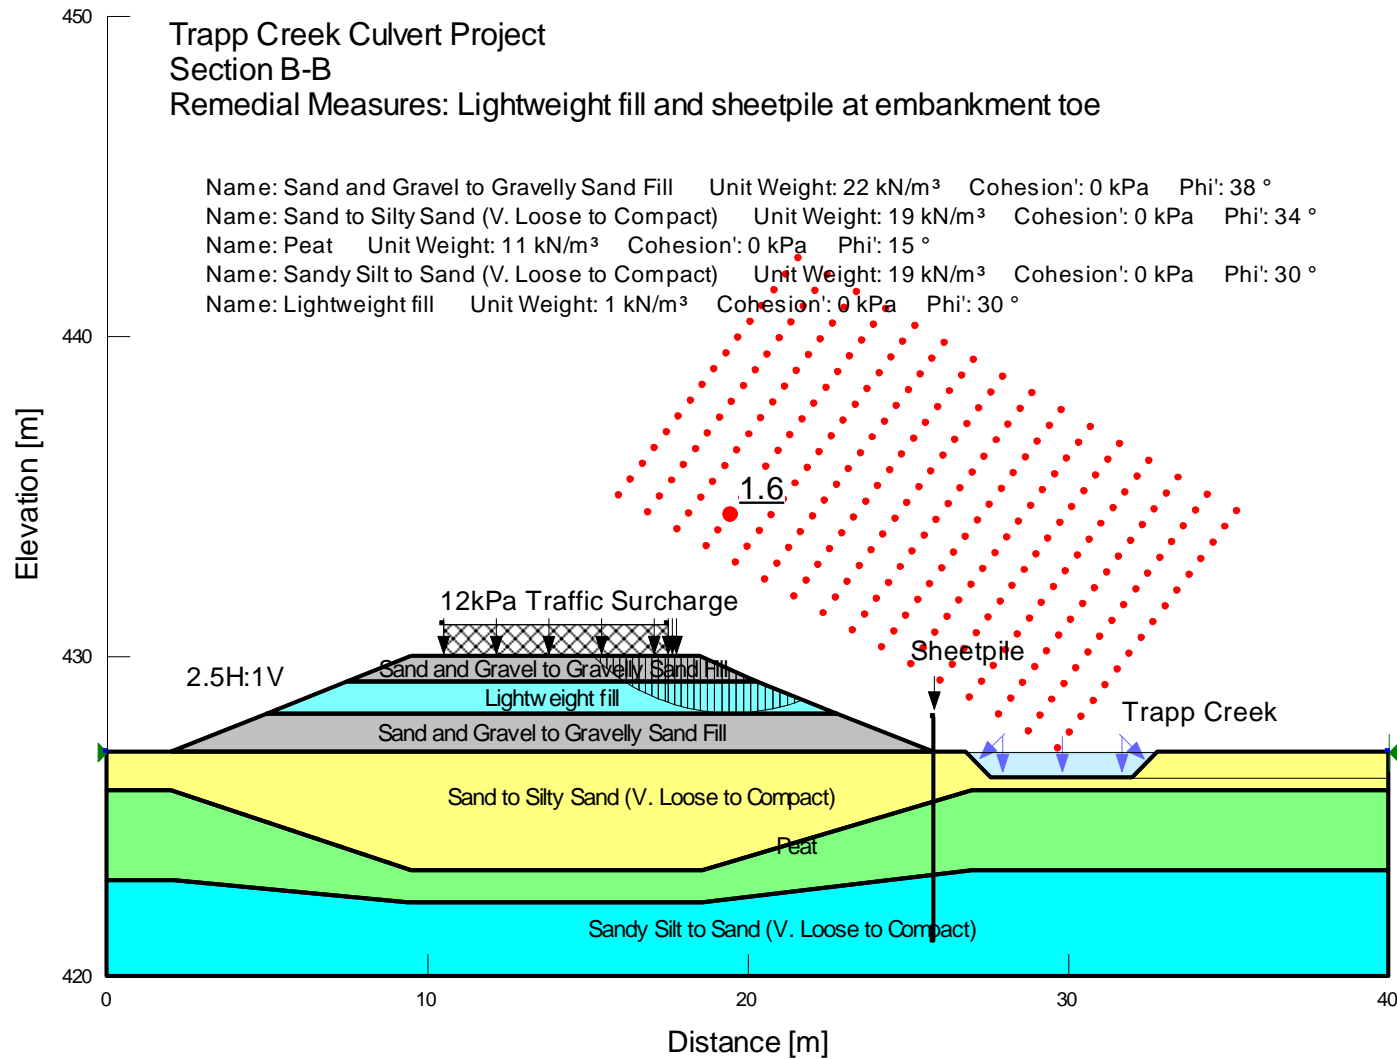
Results of slope stability analyses at Section B-B; Remedial measures – lightweight fill and sheetpiles at embankment toe
